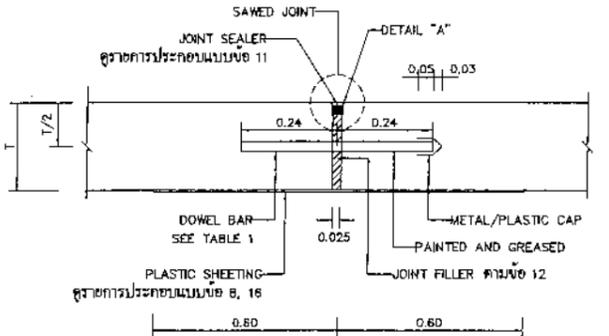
DETAIL OF JOINT BETWEEN NEW AND EXISTING CONCRETE PAVEMENT (TRANSVERSE JOINT)
